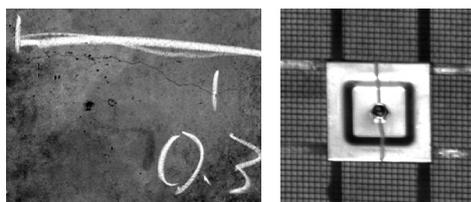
Expansion images reveal 0.3 mm cracks and bolt counter marks.
